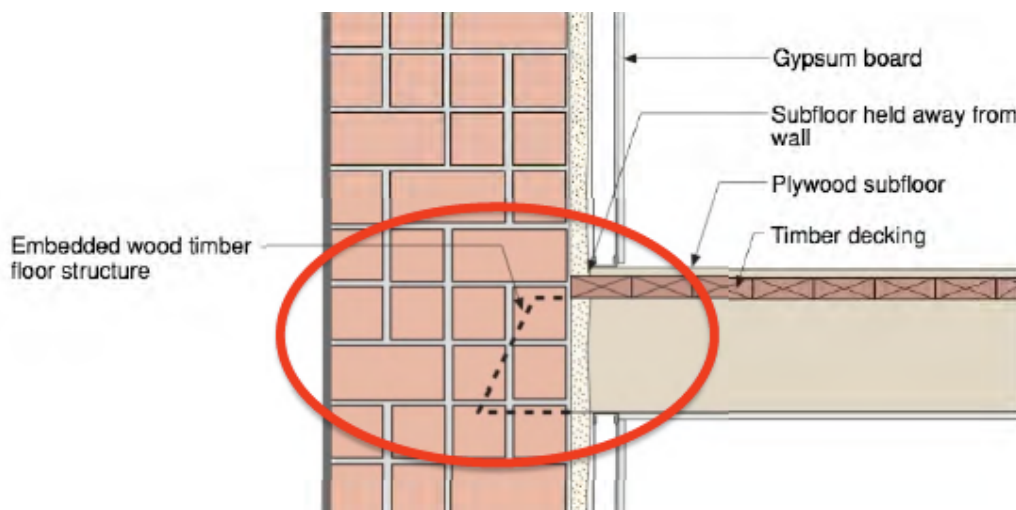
Embedded Wood Timber Floor Structure (Ueno, 2011)
